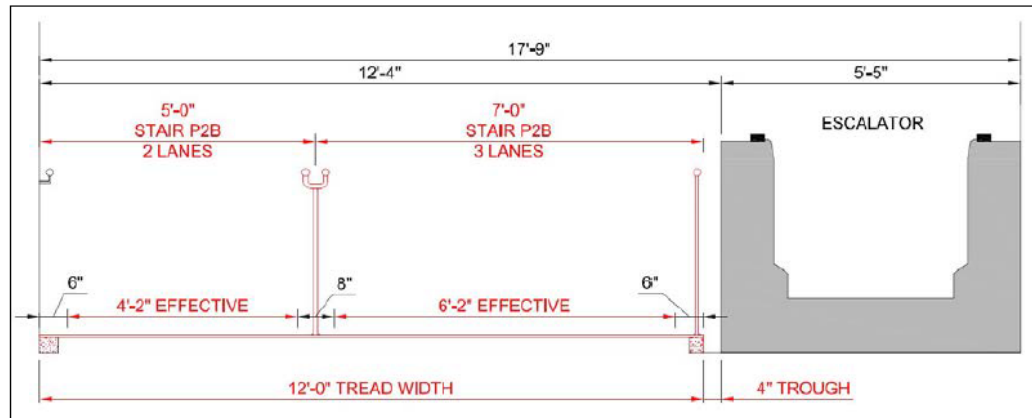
Cross Section of Stair S2/P2 showing infilled troughs and an offset center handrail.
